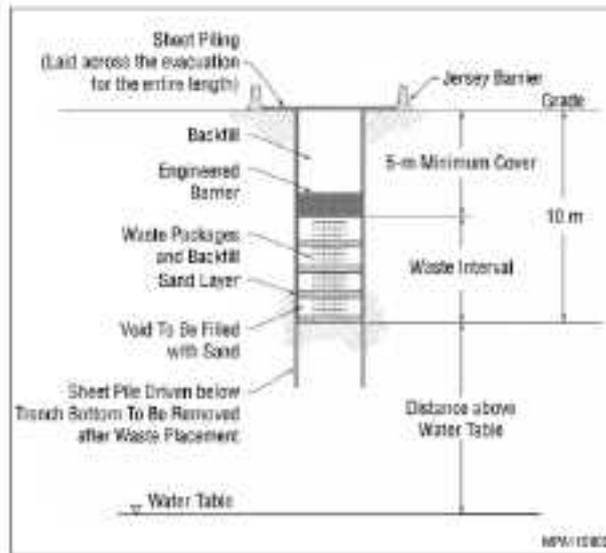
Cross Section of the Conceptual Design for a Trench
